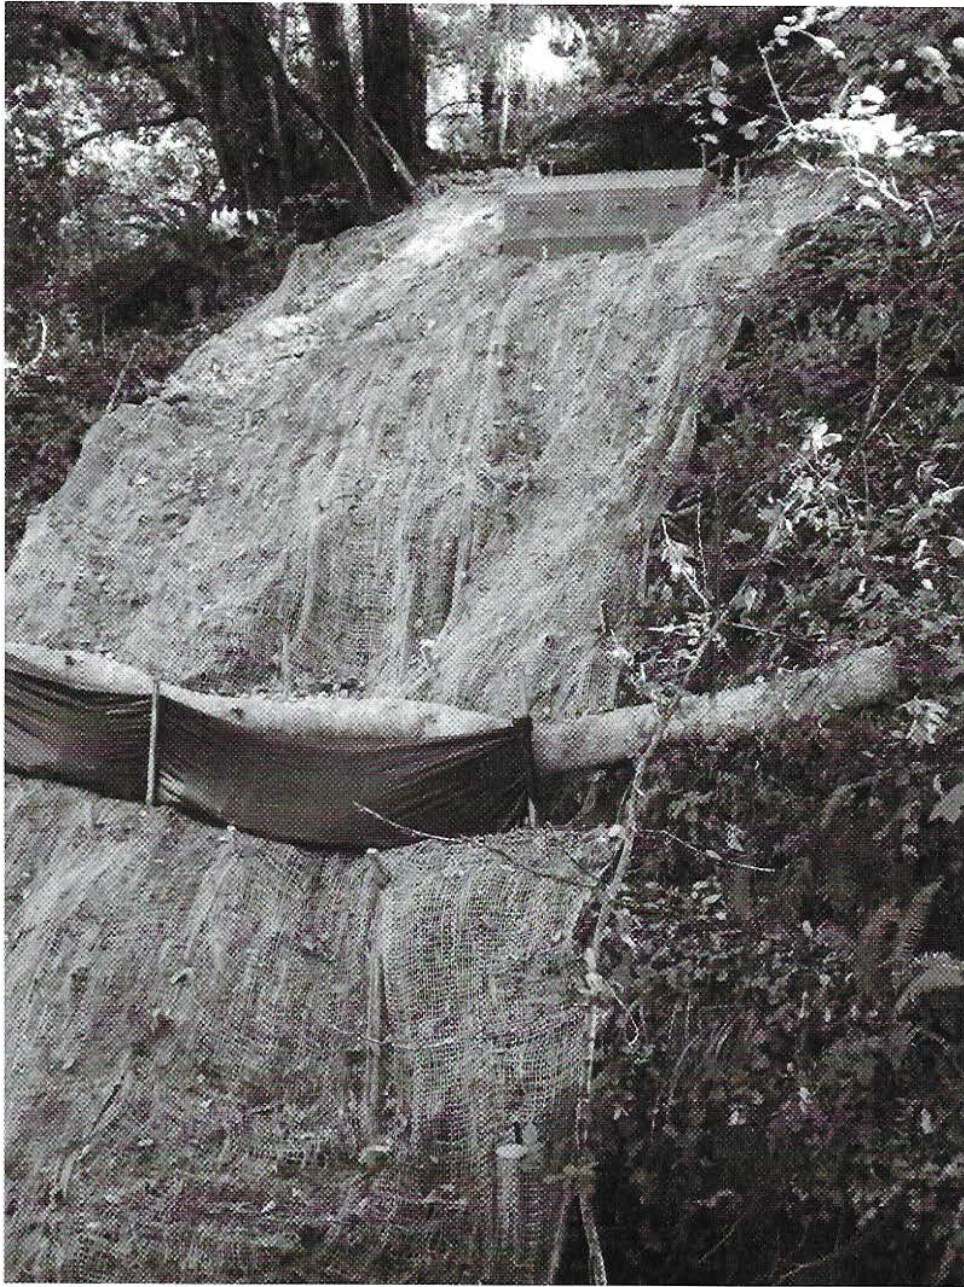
Concrete bridge footing for a planned bridge at drainage A. The County required erosion control measures implemented on the steep drainage banks.
